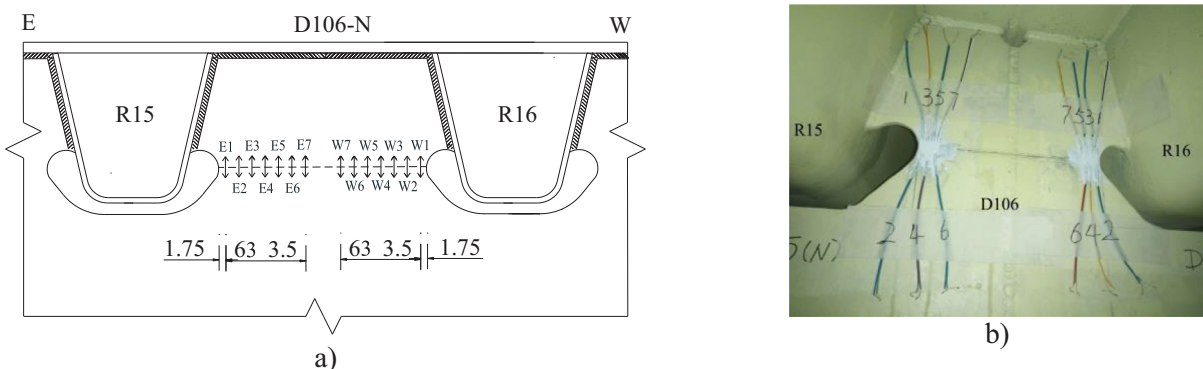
Strain gauges close to retrofit cutout detail, a) arrangement; b) on real bridge.
